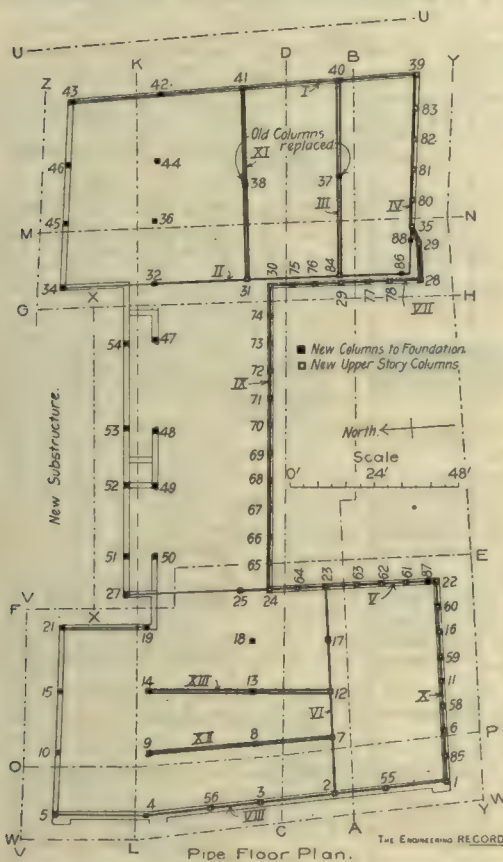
PLAN OF GIRDERS OVER OLD BUILDING.
